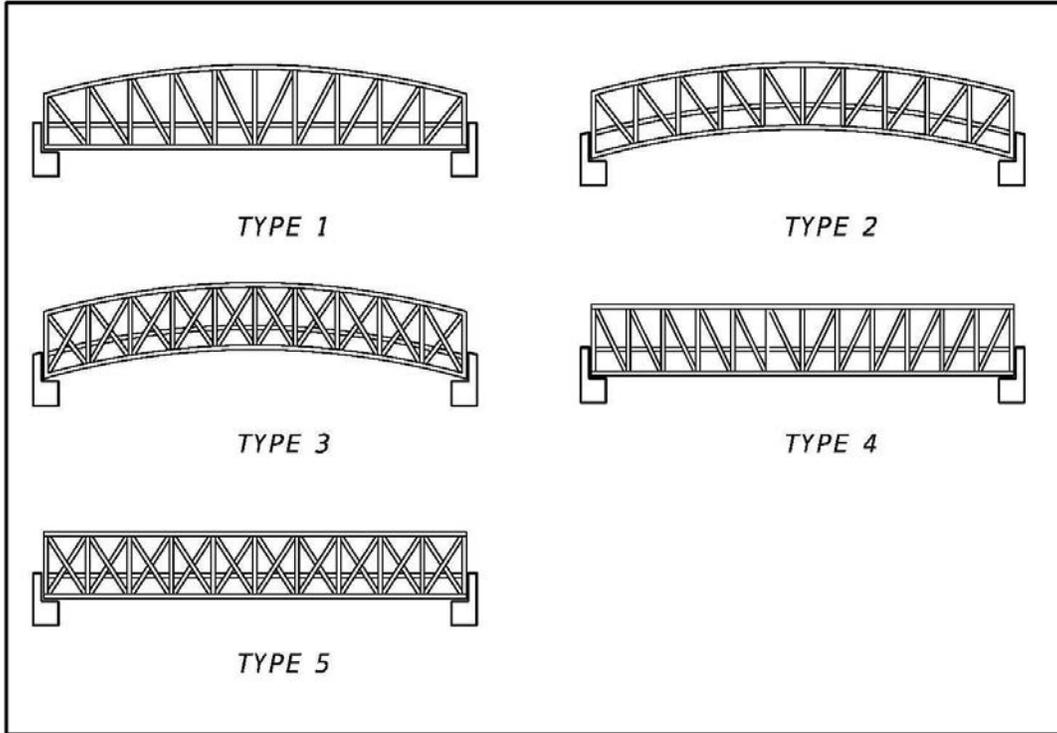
Prefabricated Pedestrian Bridge Standard Truss Member Shapes
